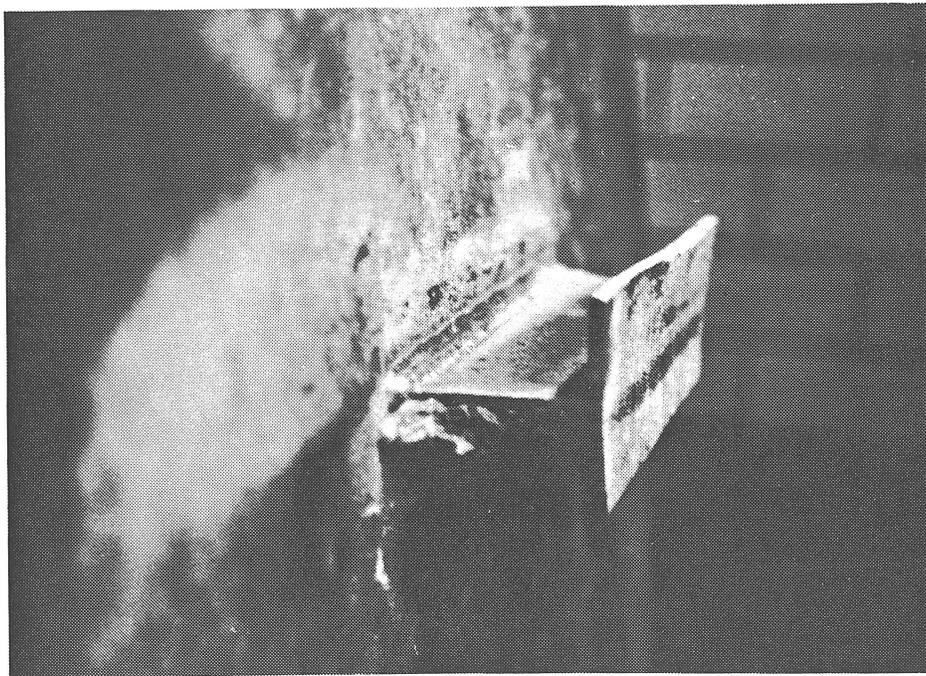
Specimen T-1. Liner Anchor (Tee) After Test
